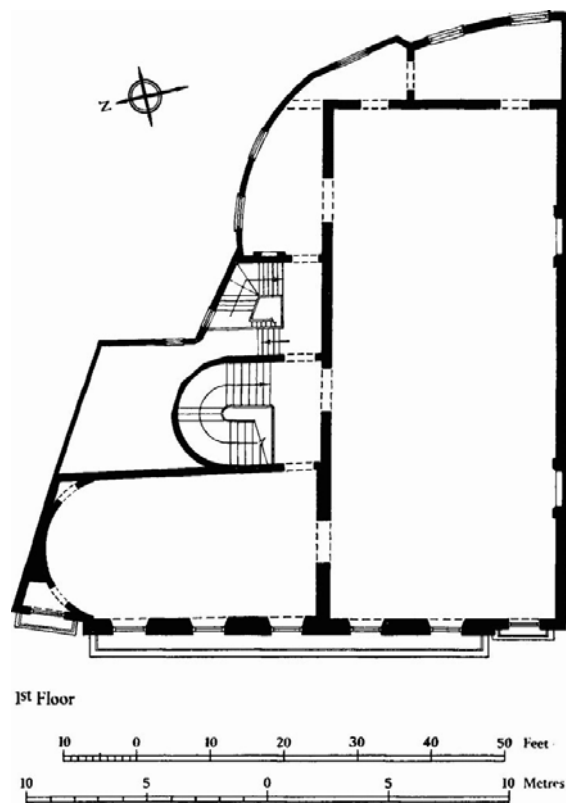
Modern first floor plan showing the constrained footprint of the site and principal rooms, staircases and rear service rooms. (c) RCHME
